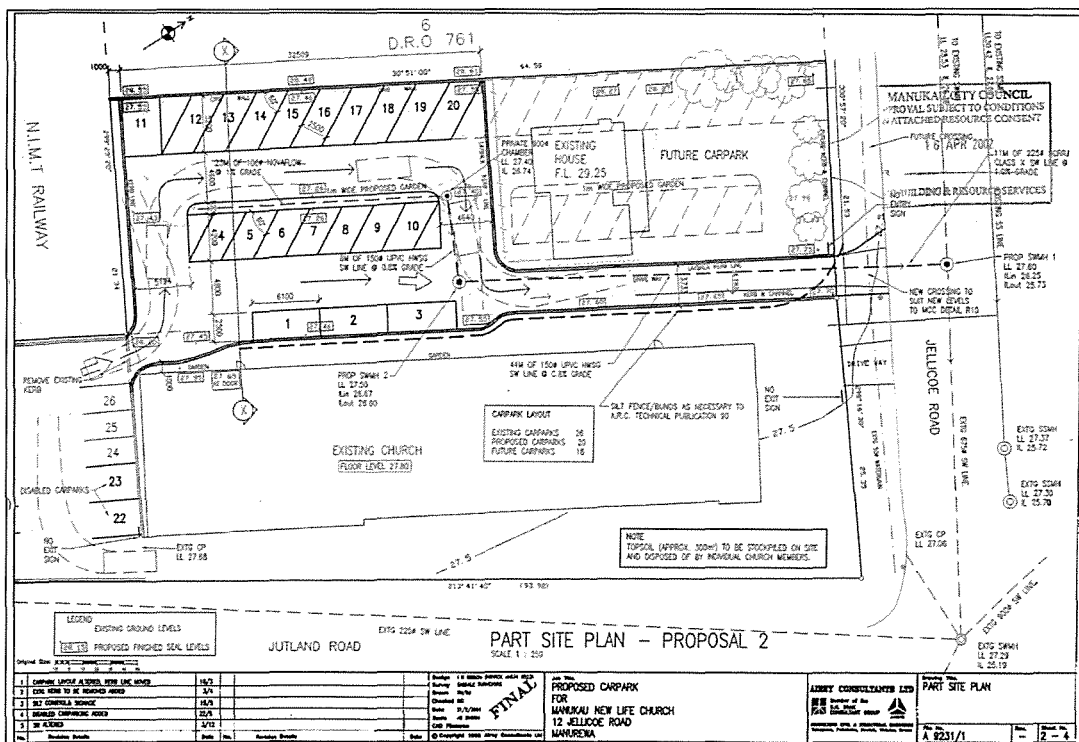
ENGINEERS PROPOSED LAYOUT/DESIGN
